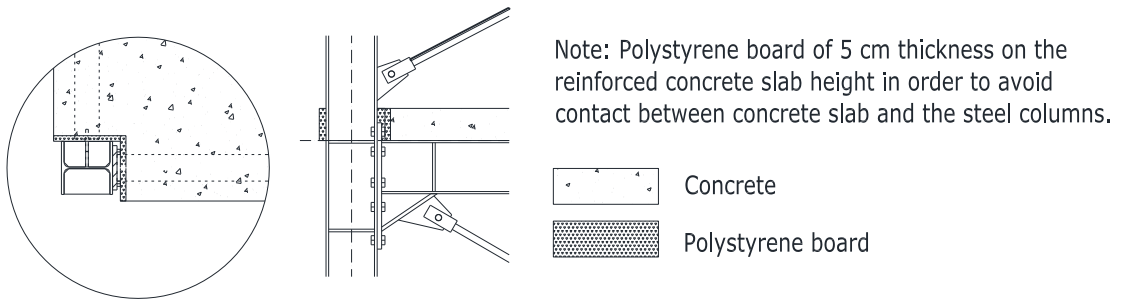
Details of gap between r.c. slab and steel columns.
